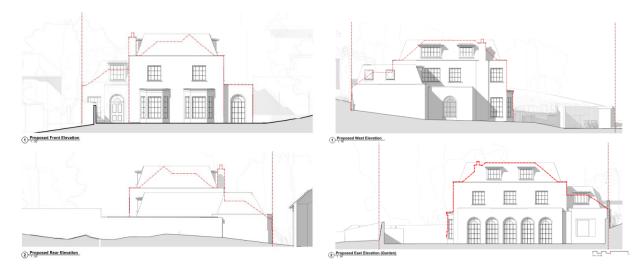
Proposed elevations (top left – south, bottom left – north, top right – west, bottom right – east)
